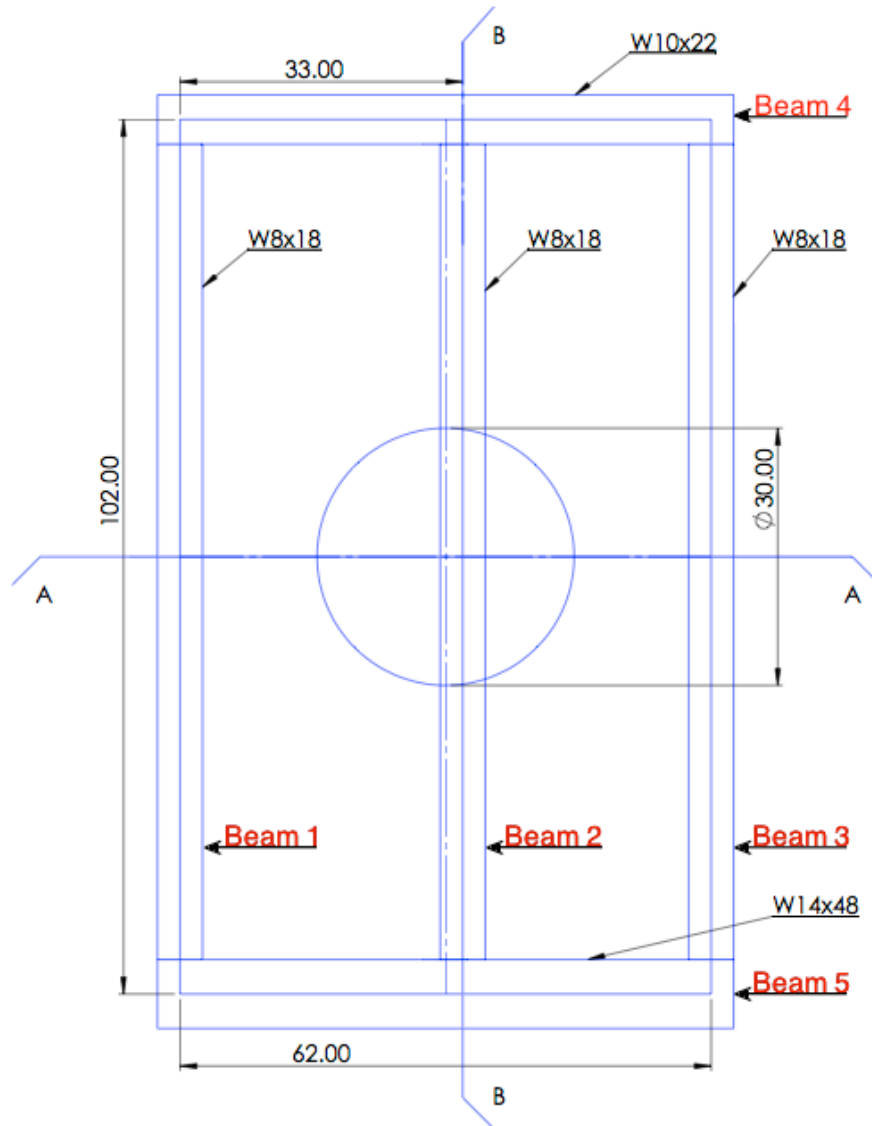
Existing AAA Beam Configuration on the 7th Floor
